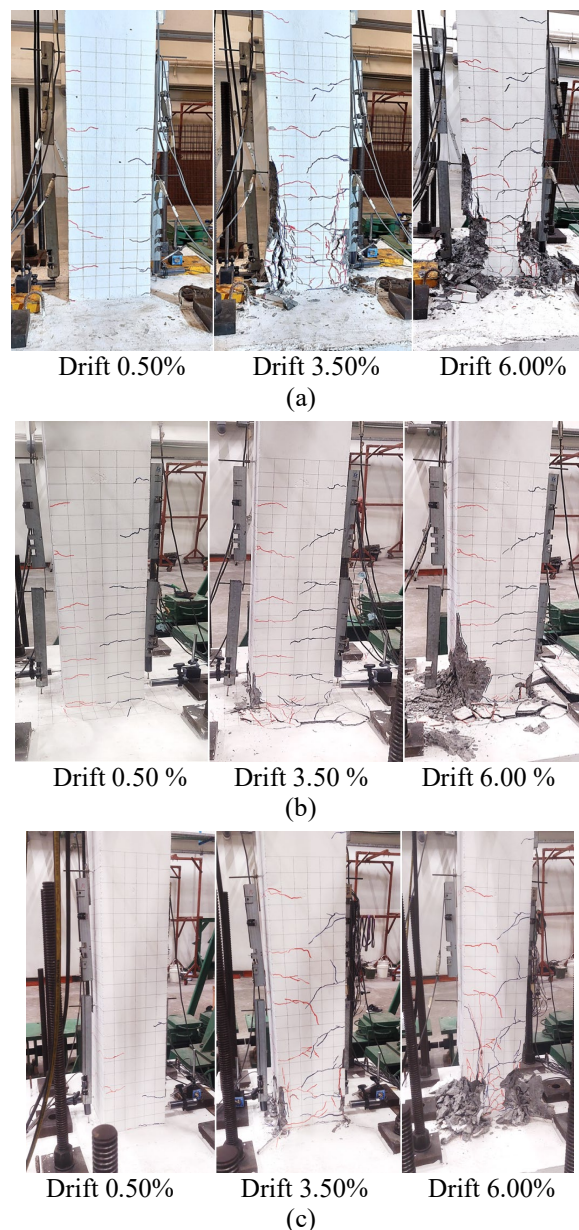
Damage Patterns of Precast Column-Foundation Connections: (a) MC; (b) PC; (c) BPC
